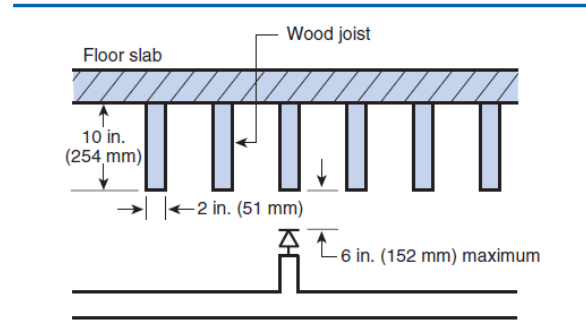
Placement of Standard Spray Upright Sprinklers Underneath Solid Wood Joist Construction.
